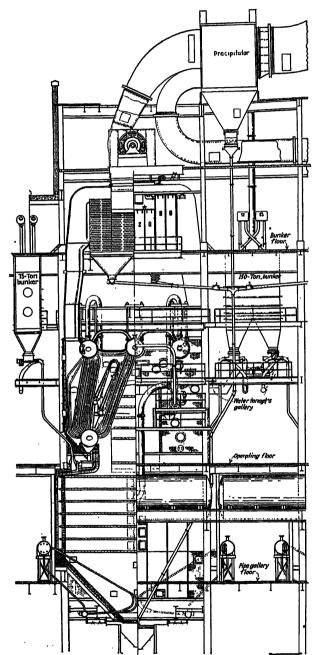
ELEVATION AND PART SECTION, ONE COMPLETE BOILER UNIT
